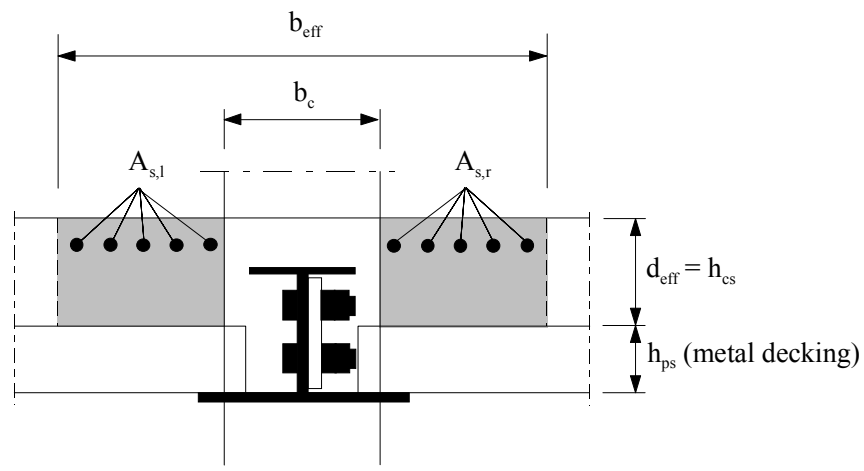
Concrete cross-section and reinforcement used in the definition of reinforcement ratio.
